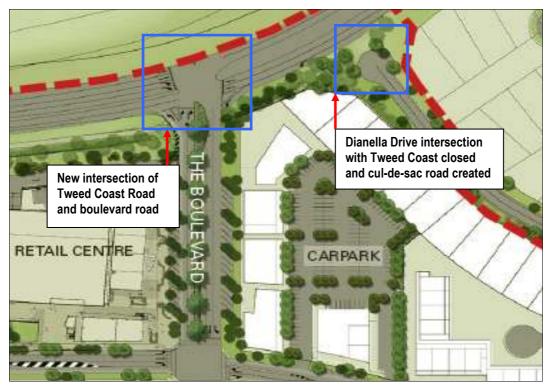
Closure of Dianella Drive and new intersection of Tweed Coast Road and Boulevard Roads (source: Preferred Project Report)
